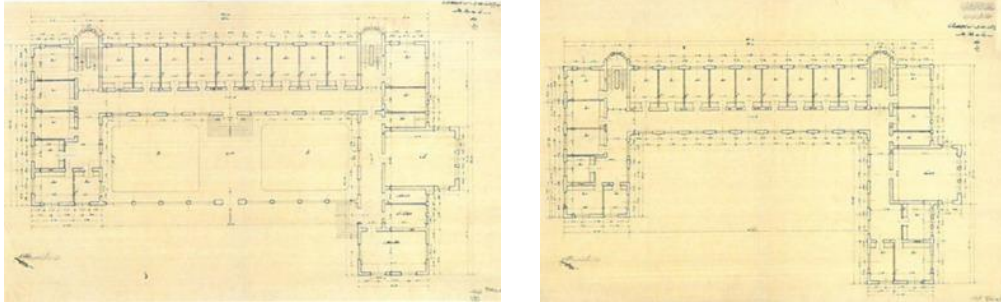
a) Ground Floor Plan of Hamid-i Evvel Madrasa in Sultan Selim, b) First Floor Plan of Hamid-i Evvel Madrasa in Sultan Selim[51]
